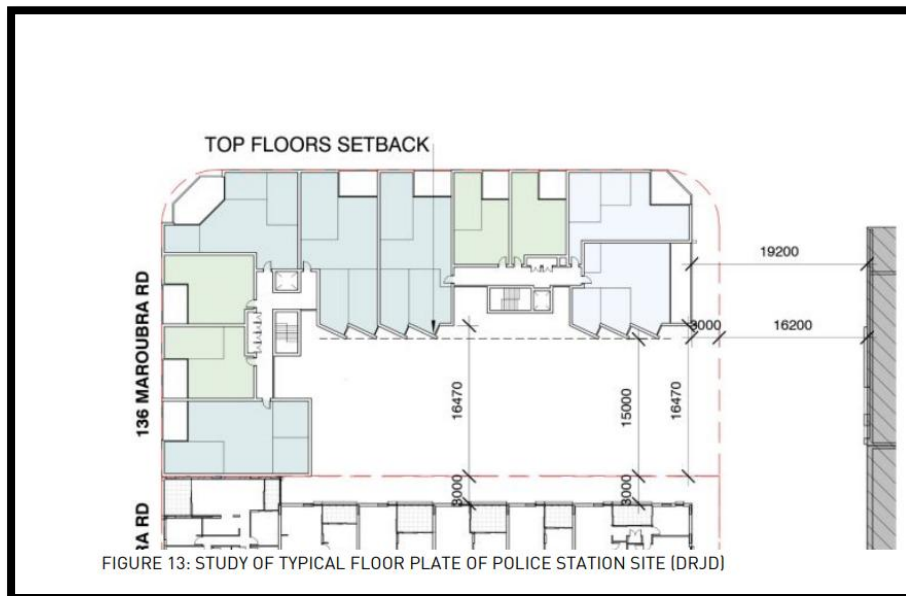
Inequitable share of building separations with the Police Station (Source: Applicant)
